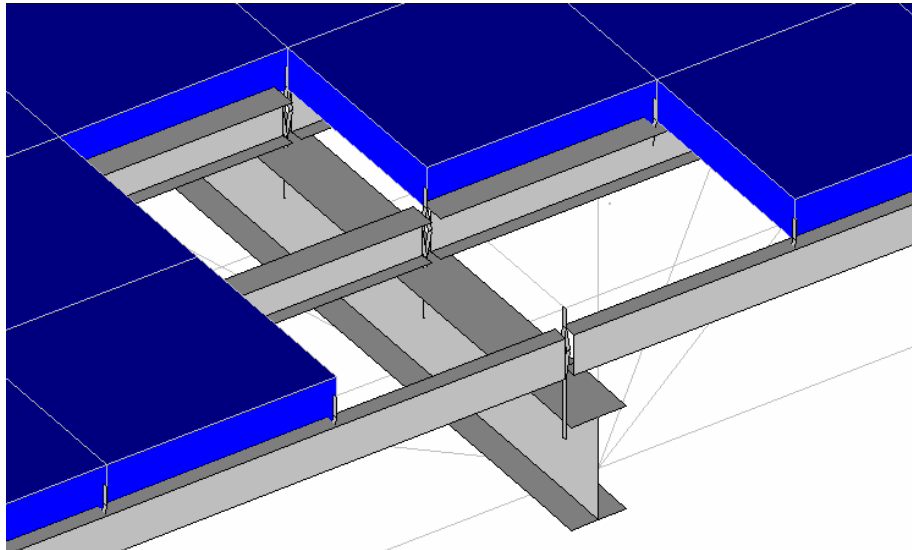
Blue River Bridge: Rendering of deck timber deck on steel stringers on steel floor beam. The mutually orthogonally deck timbers have been treated as a single monolithic solid.
